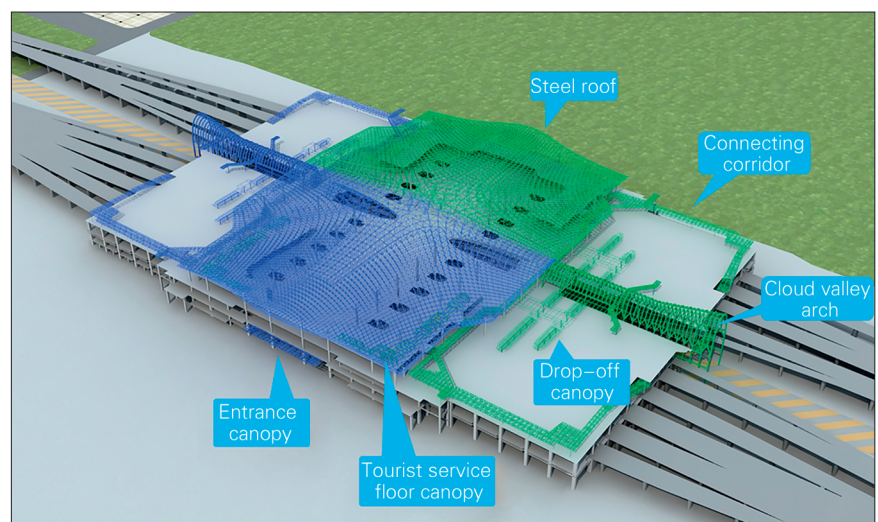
Rendering of steel structure of Hangzhouxi Railway Station
